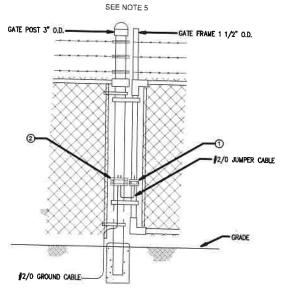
CONNECTION TO SKID SEE NOTE 5
